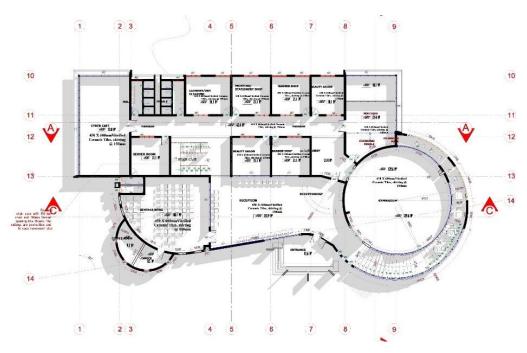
An architectural illustration of the ground floor plan. Source: Author's field work (2023)
